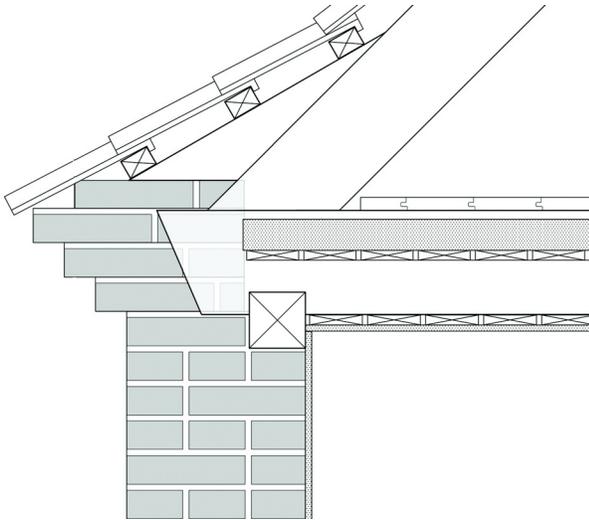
Vertical section of the joint between the base of the roof and the load-bearing exterior wall.
